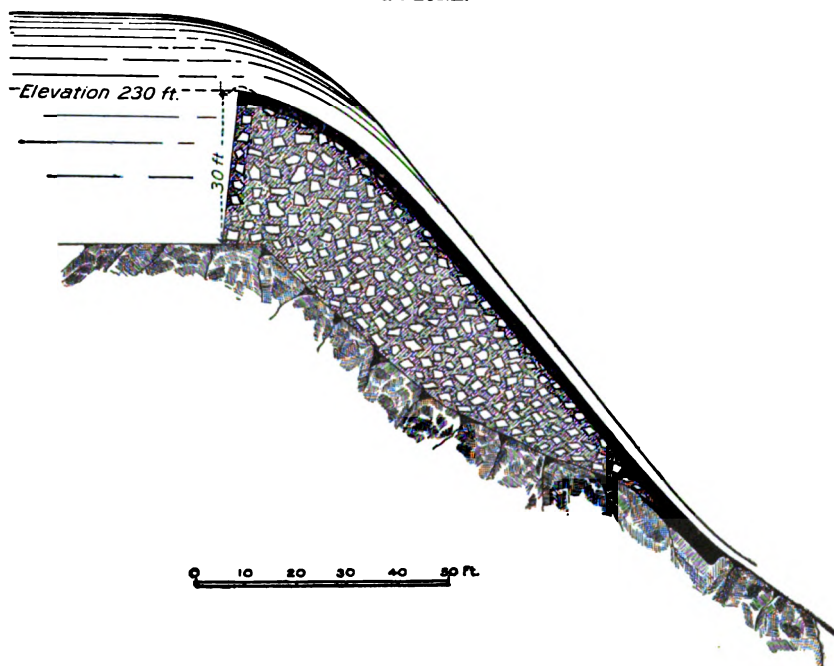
SAN CARLOS-DAM, ARIZONA, SECTION THROUGH SPILLWAY.
